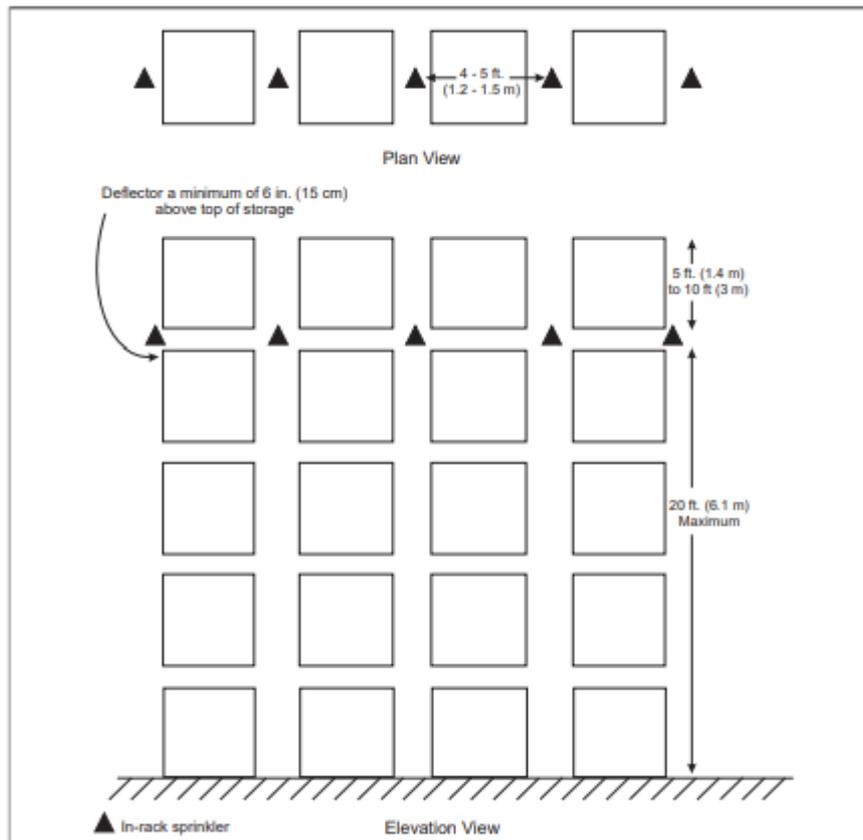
Single row rack sprinkler layout - fire protection scheme E.
